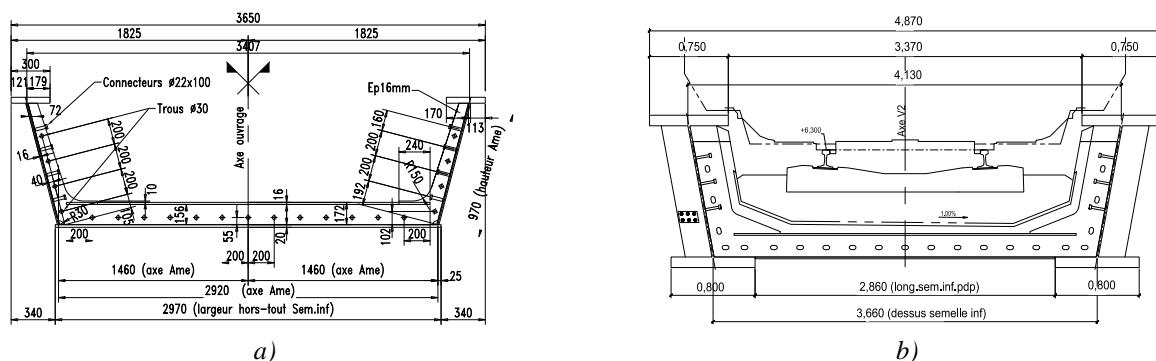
Cross-section of the French composite bridges: a) “U”-shape composite with steel sheet in the bottom 070000_219+422 ($L = 9.2$ m) and b) Upper lateral inclined girders composite connected by spaced steel transversal beam at the bottom 810000_097+770 ($L = 24.7$ m).
